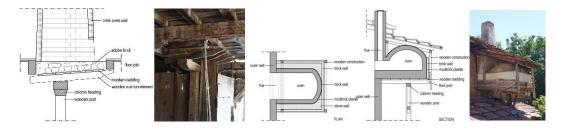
Oven detail of house number 71 B *Figure 18.* Oven plan and section detail of house number 34
